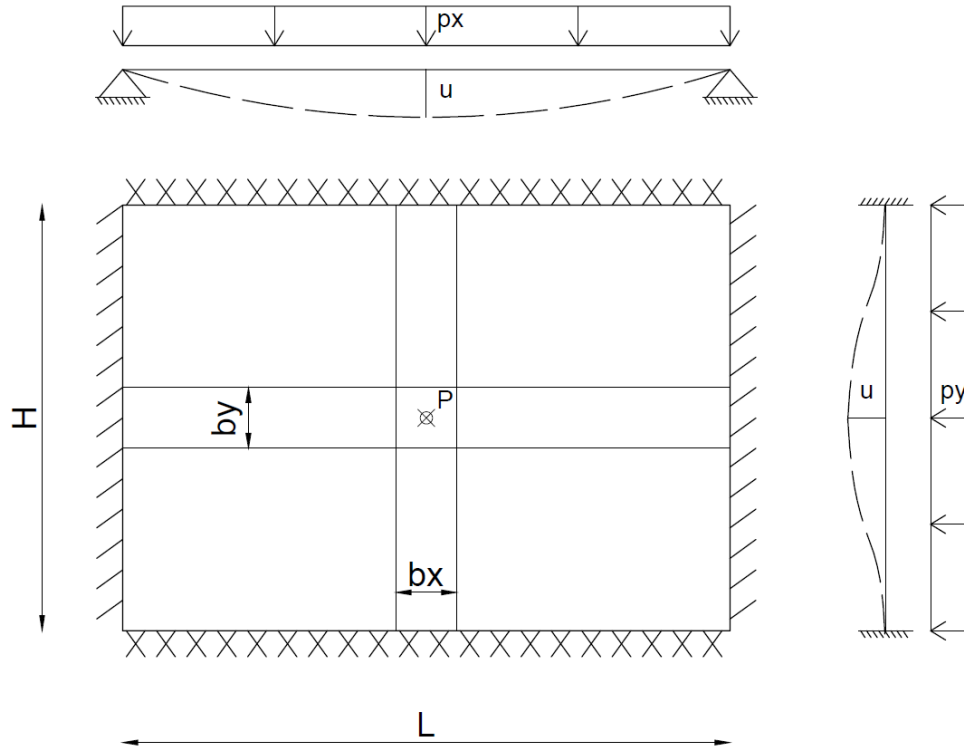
Wall schematised as two beams, one spanning vertically and one spanning horizontally.
